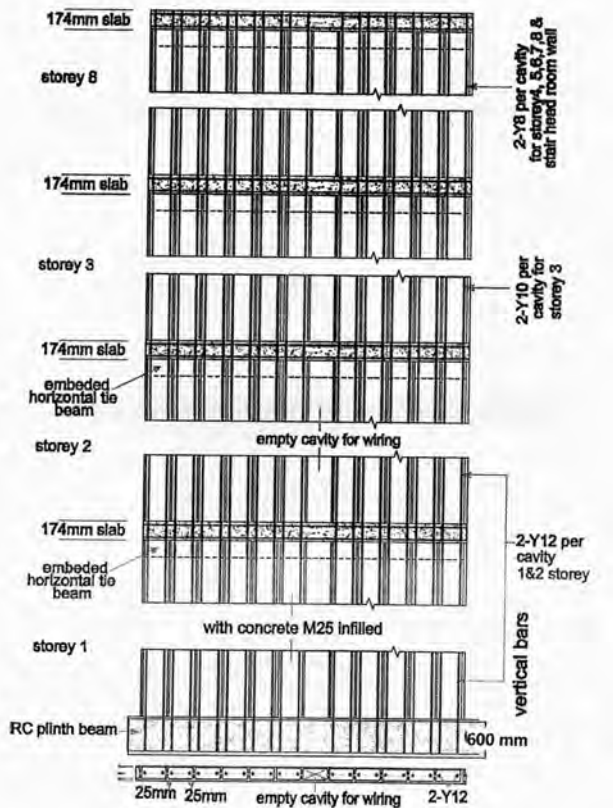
Longitudinal sectional view of walls showing vertical reinforcement details
